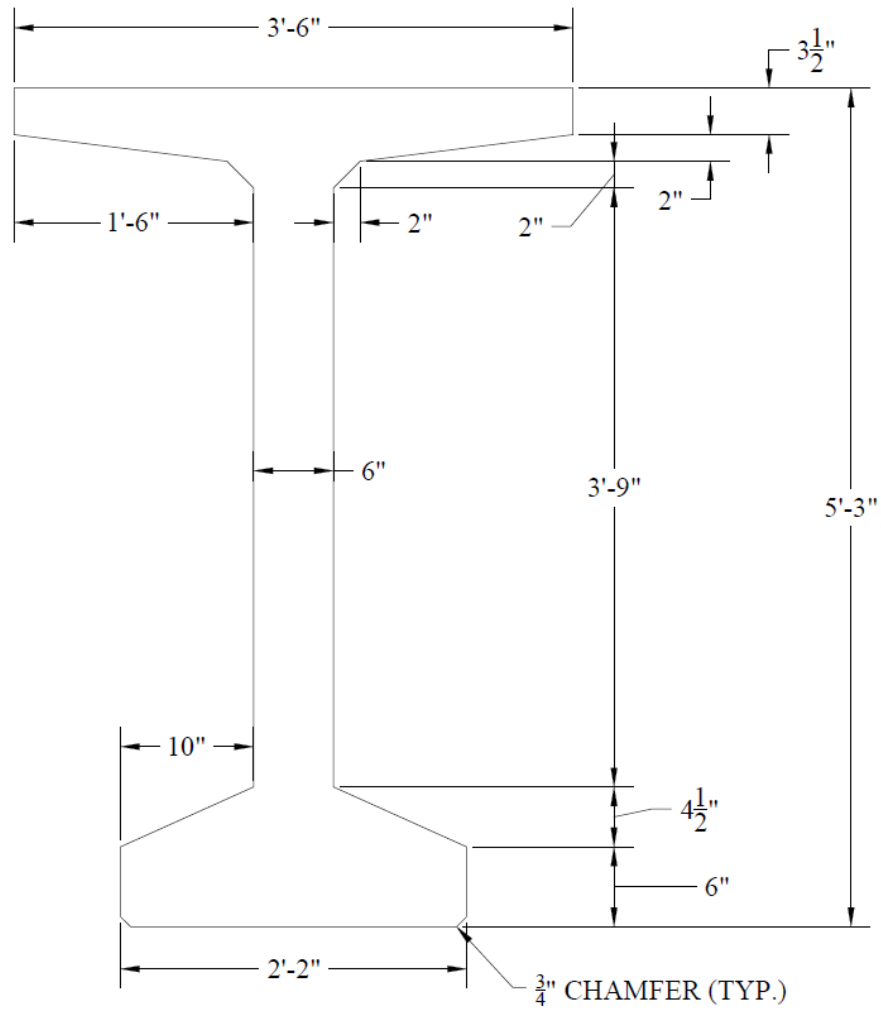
Type BT-63 Prestressed Girder (MOB-1)
